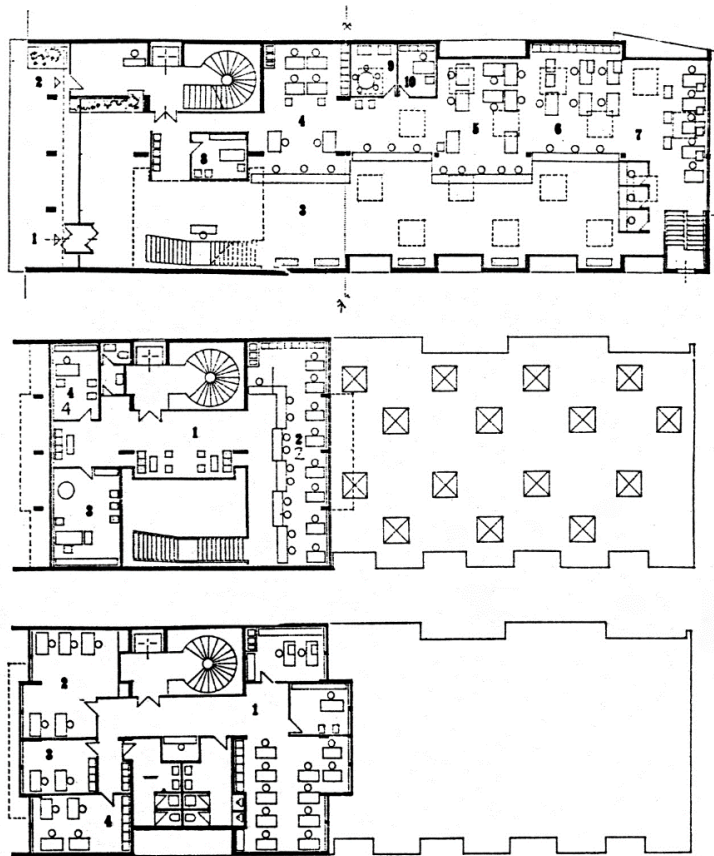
The floor plans of Ziraat Bank Bakırköy Branch, 1969
